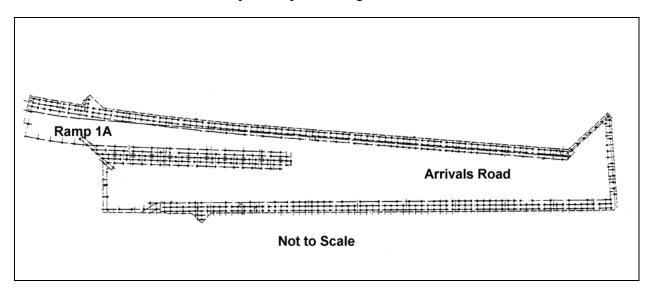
Site plan, piling layout for the arrivals tunnel at Logan Airport.⁽¹⁸⁾
